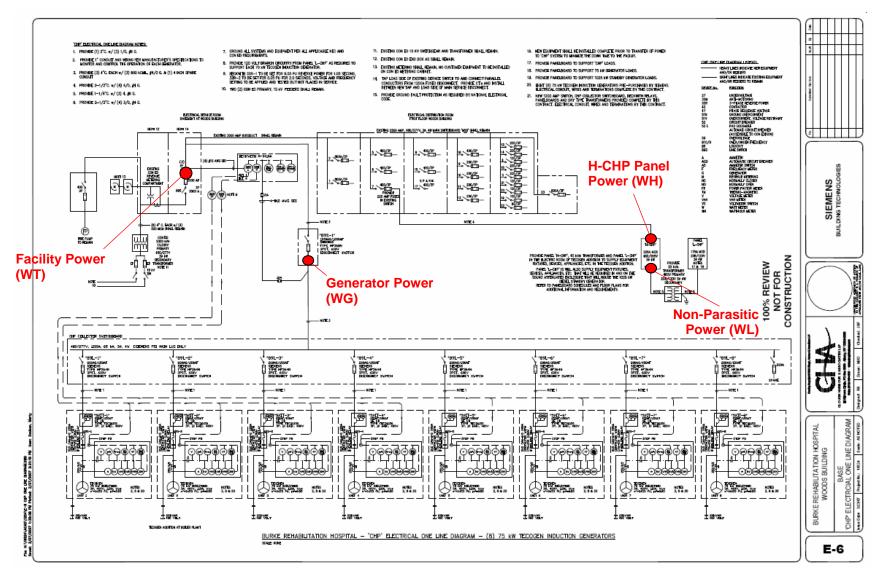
One-Line Schematic (Drawing E-6) Showing Locations of Power Measurement Points
